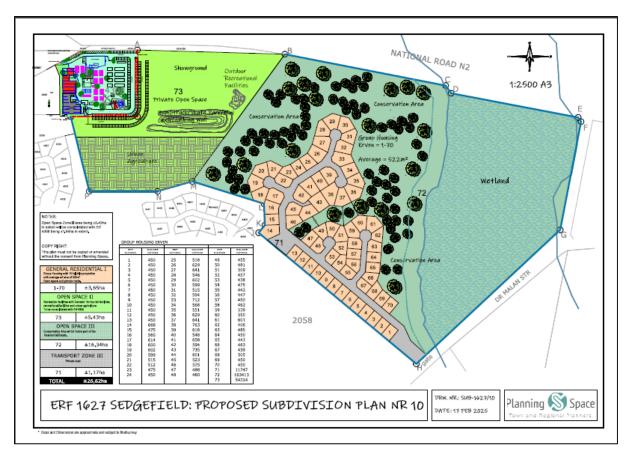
Showing the preferred alternative layout plan for the proposed development.
